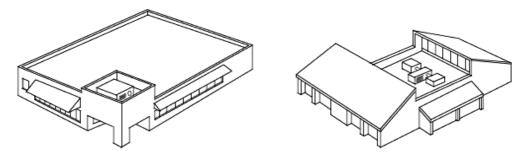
Examples of how to screen roof-mounted mechanical equipment.
